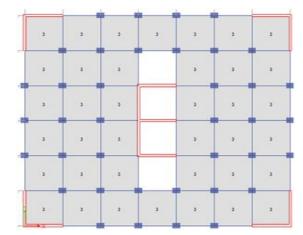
Plan of Building at 10<sup>th</sup> Floor level (SDL = 3 kN/sqm)
